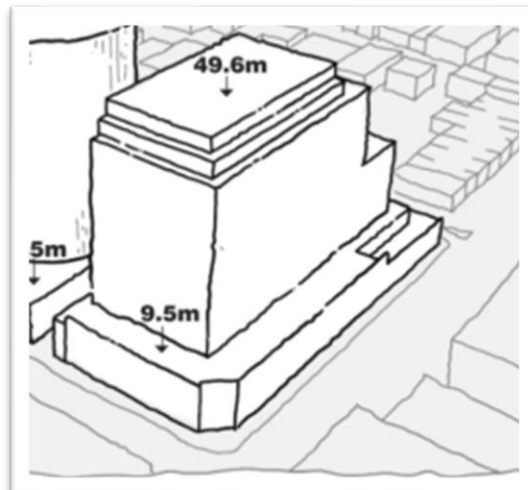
Upper level setbacks of Building A. Source: Development Plan (Gurner 2023)
